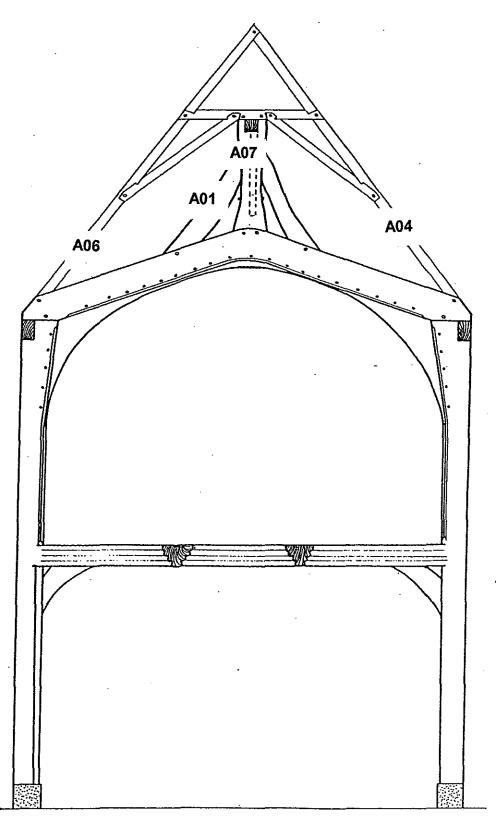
Drawing to show approximate position of sampled timbers in the roof of the east wing (viewed from the north looking south)
